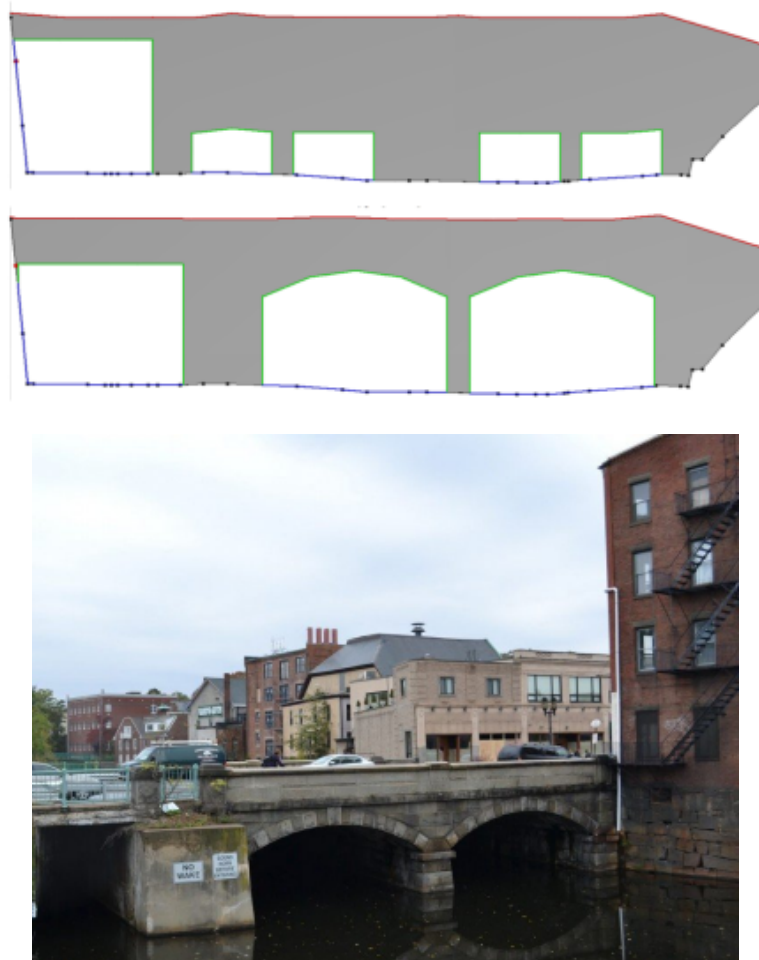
Pre- and Post-reconstruction cross sections of the Craddock Dam (top); and Photo of reconstructed bridge Crossing (bottom)
